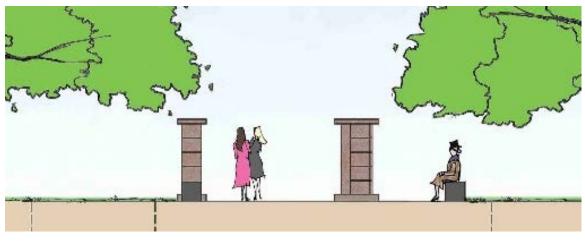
Proposed Cross-section of Cremation Walk at Legacy Gardens (Appendix B).
